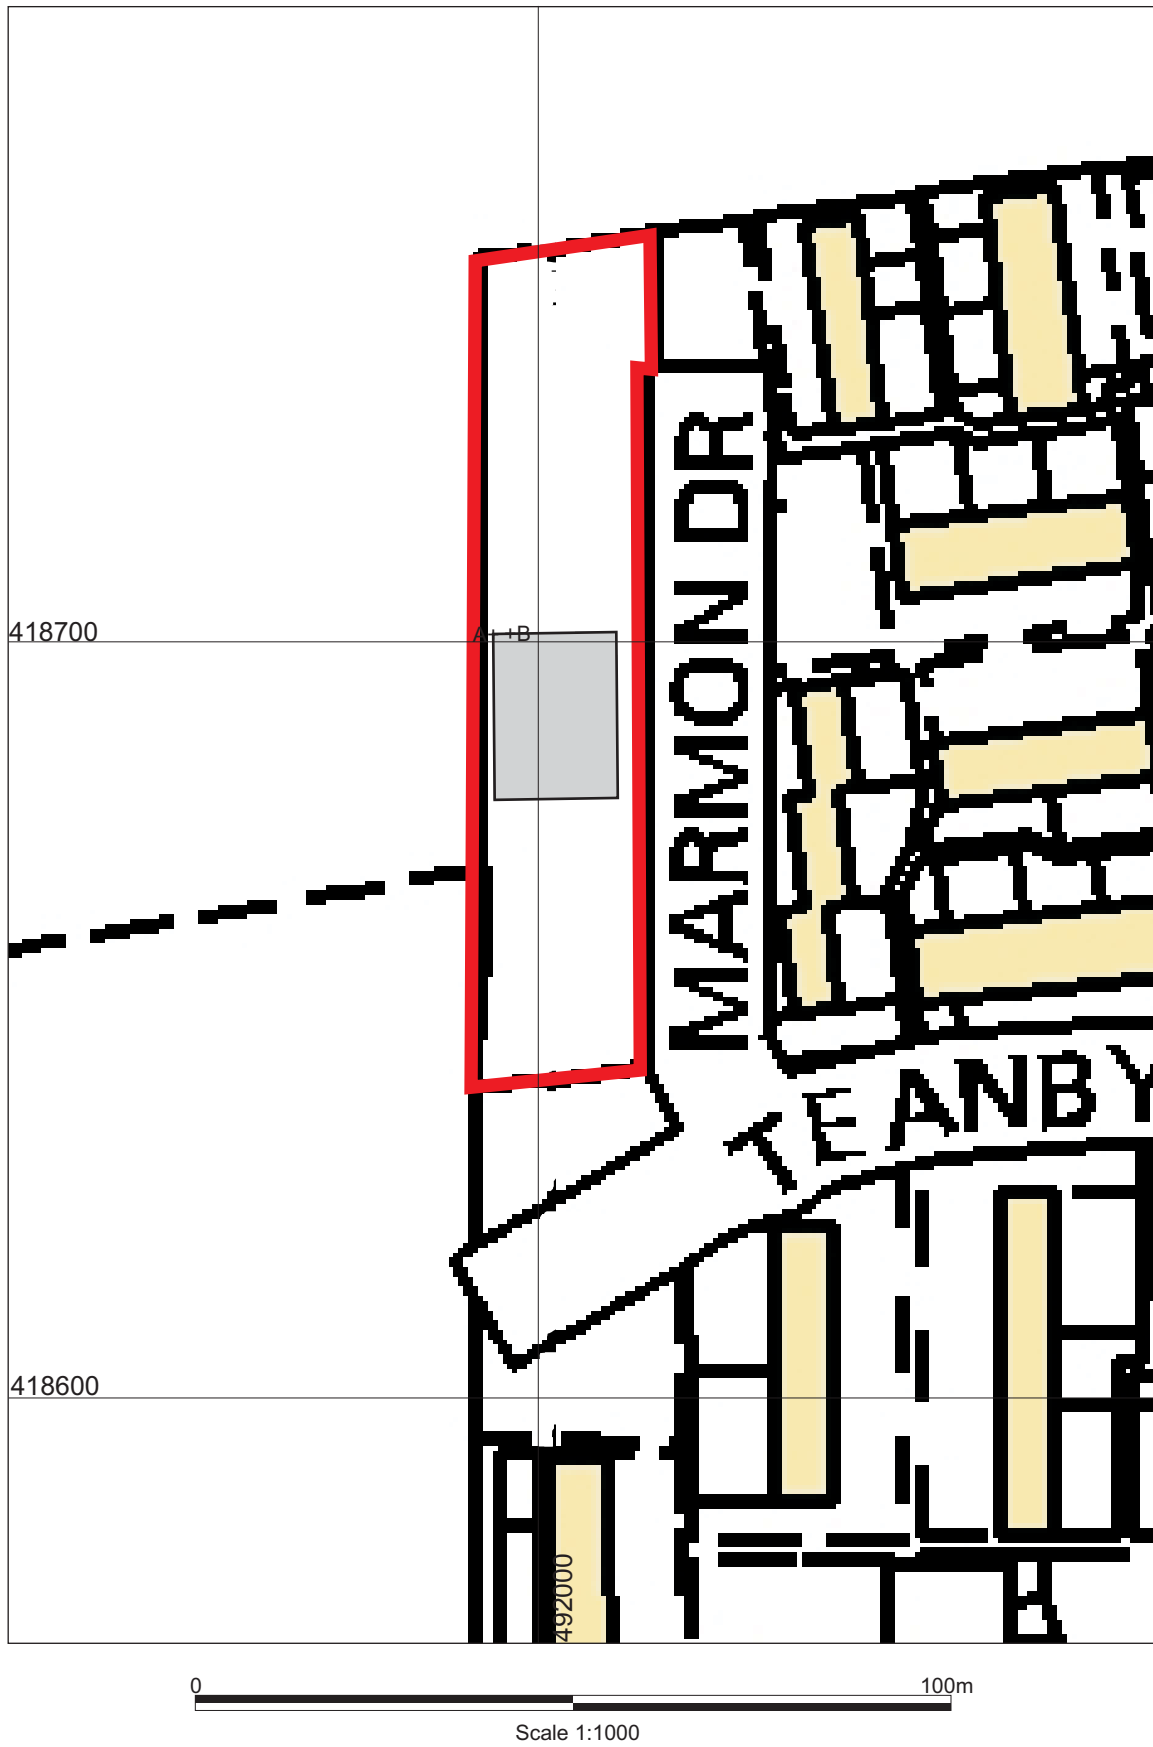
Site location plan at scale 1:1000 with site outlined in red and striped area shaded grey. Section A - B shown on Figure 3
